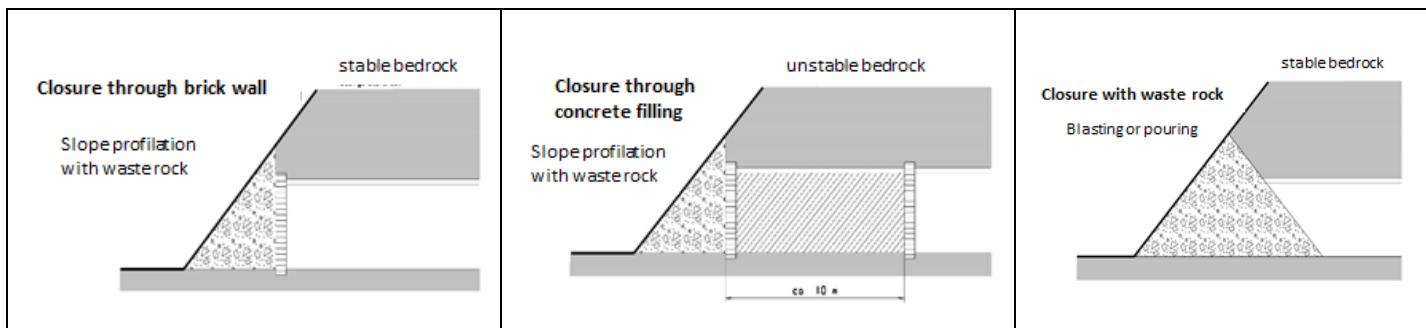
Adit sealing with a) brick wall and filling with crushed or waste rock (left), b) with fluid concrete (centre), and c) blasting or pouring with waste rock or crushed rock.
